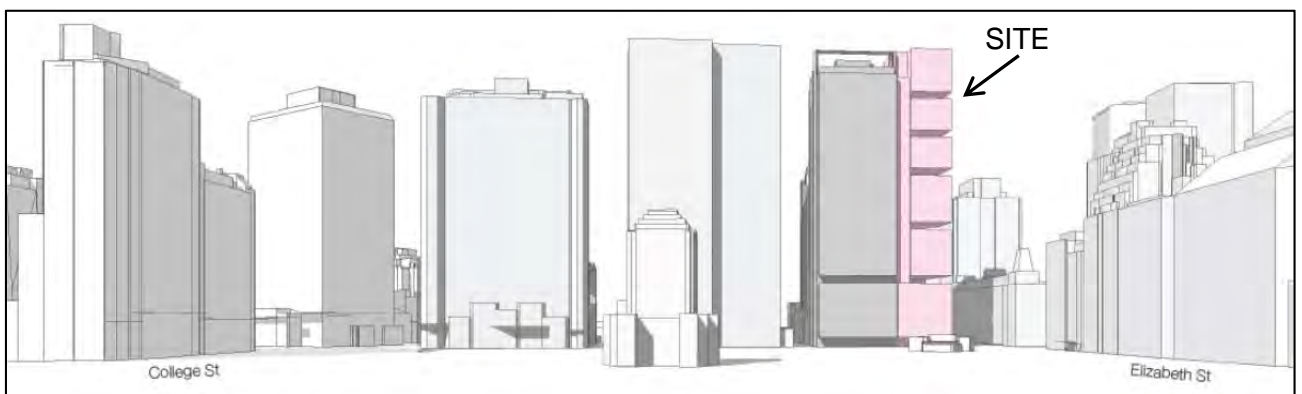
Stage 2 DA building massing (as originally lodged) as viewed from Hyde Park
